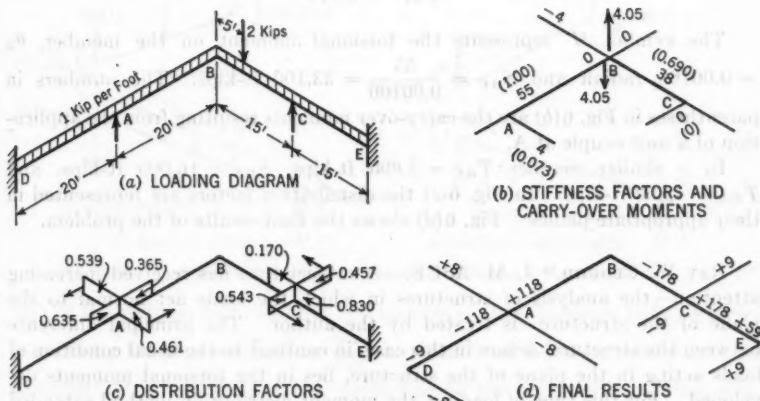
CONTINUOUS FRAMING ARRANGEMENT
